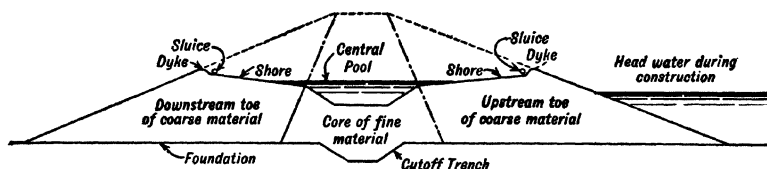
Typical Section of Hydraulic Fill Dam During Construction.
